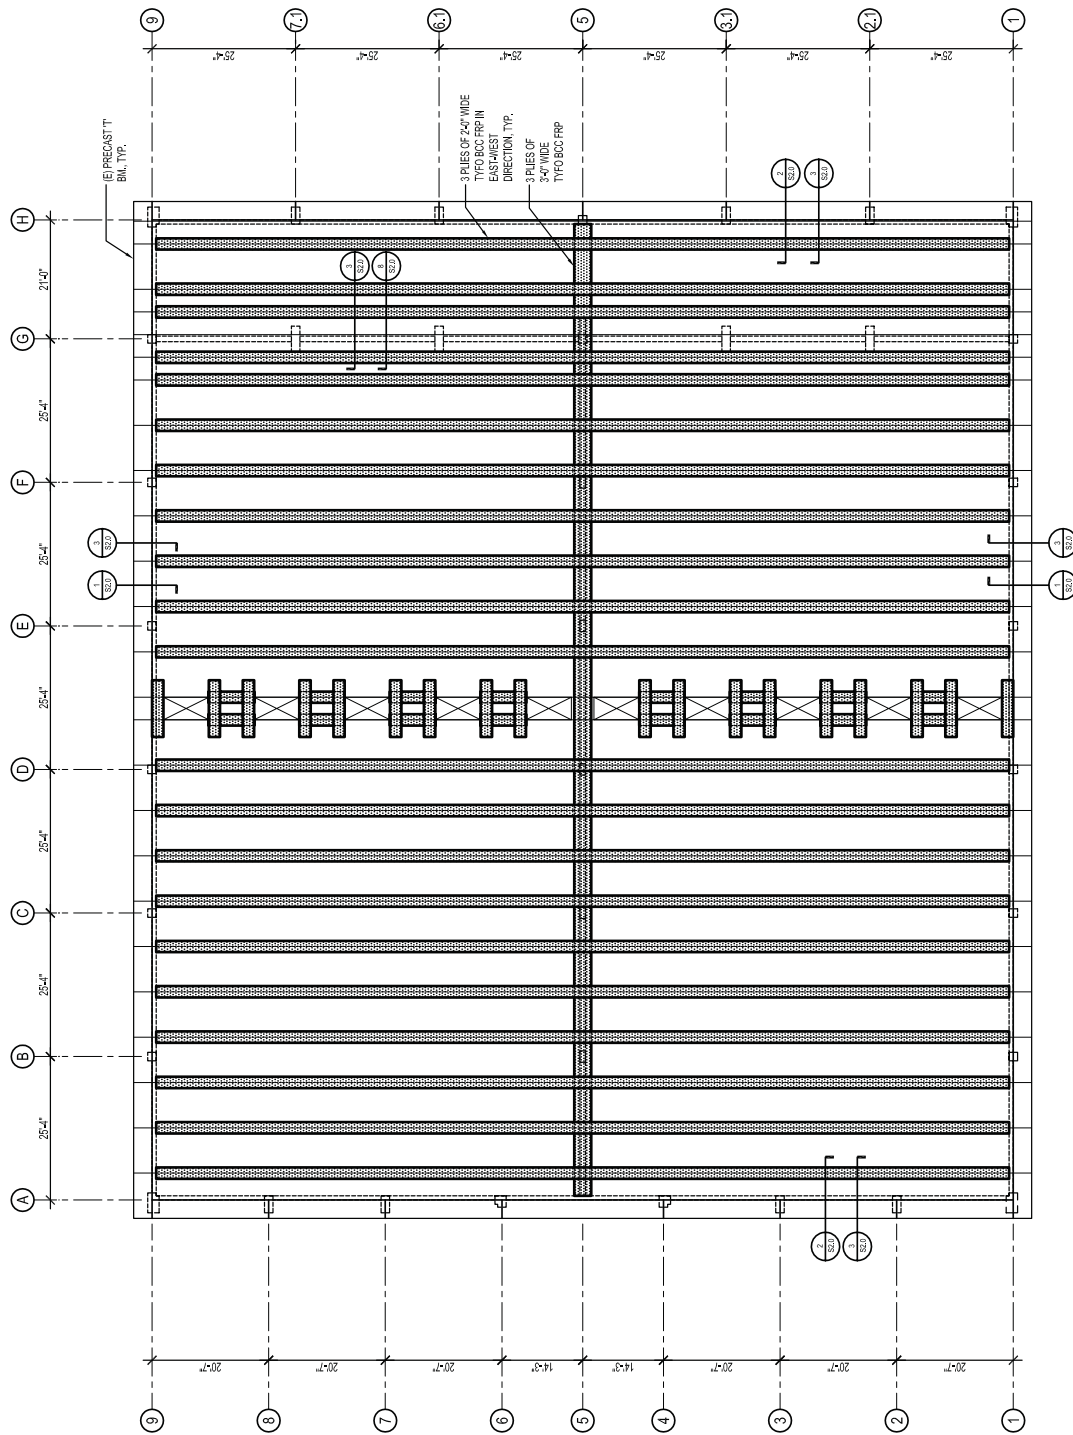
Primary Clarifier 1-4, Roof Plan
